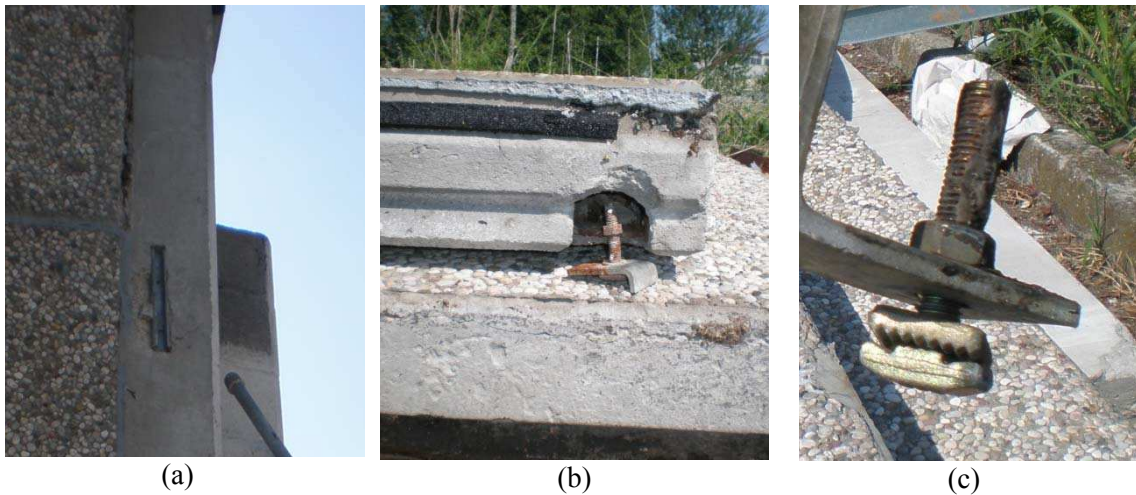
Details of a connection device at the top of horizontal panel: (a) anchor channel embedded in the column, (b) steel angle plate and (c) hammer head screw out of the anchor channel.
